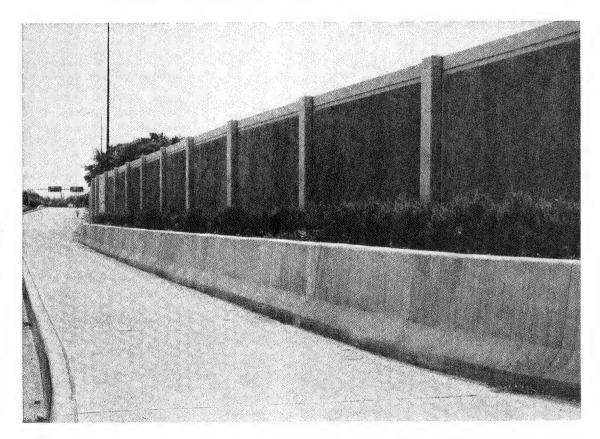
Completed precast concrete noise barrier with safety barrier and landscaping at Winnipeg, Canada (from Ulyatt and Winch 1992)
